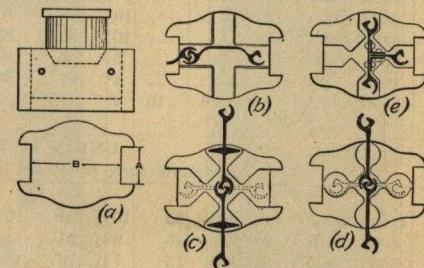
Steel sheet piling caps of the Lackawanna Steel Co.
